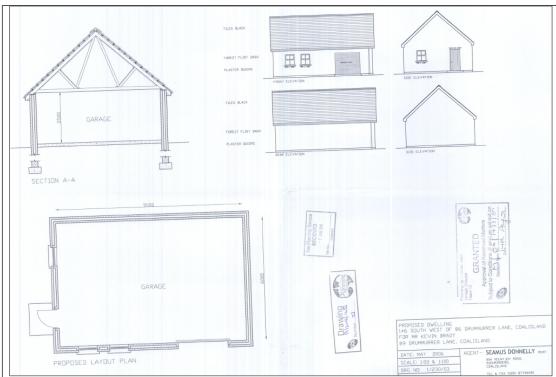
Floor plan and elevations of garage approved under M/2006/1433/RM
